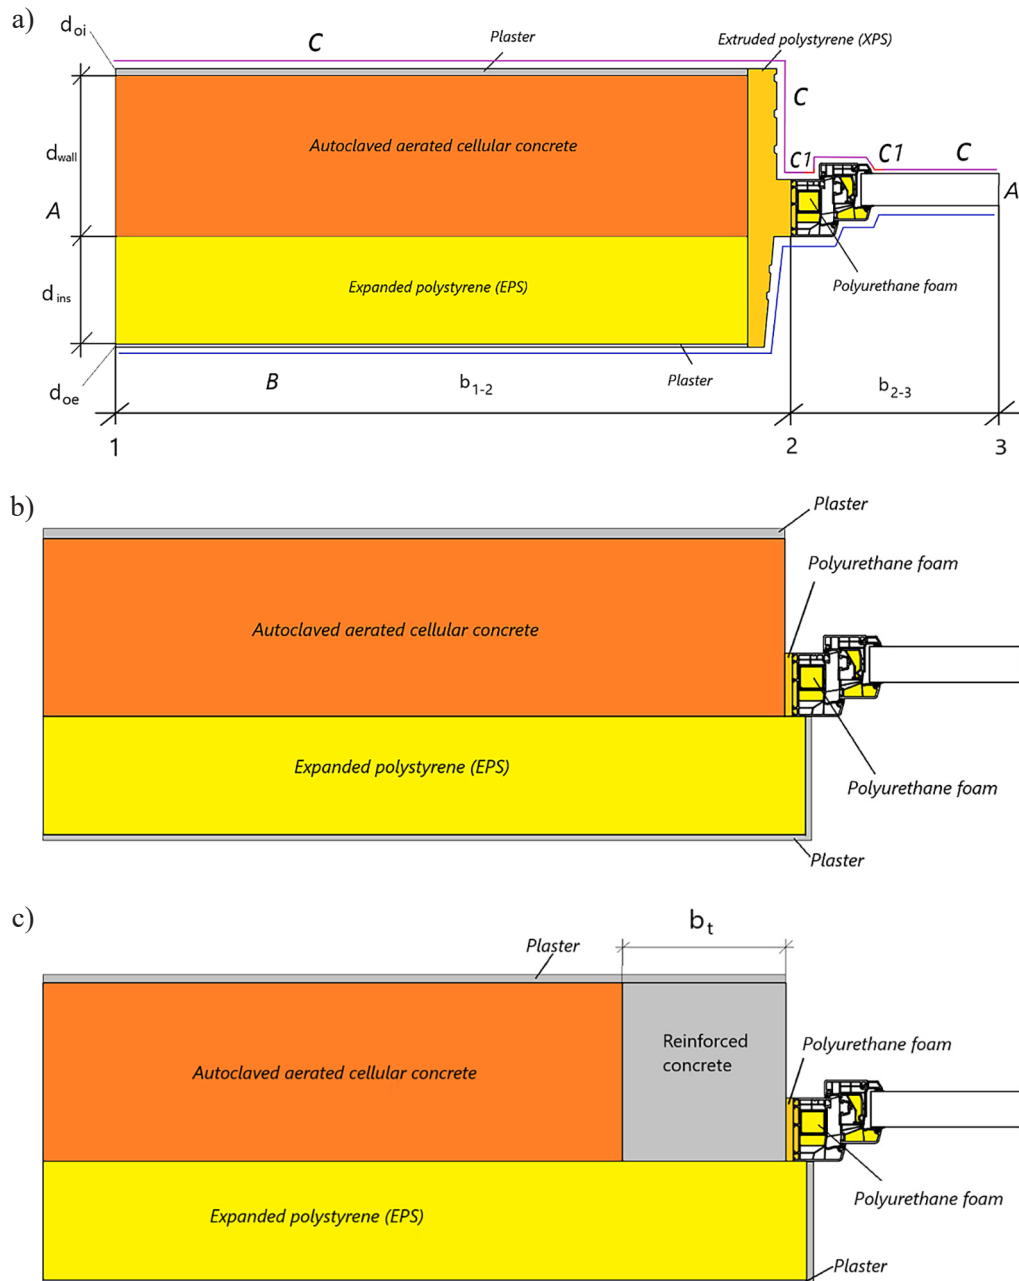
Connection of the window frame with the wall (a) sill, (b) jamb, (c) lintel
